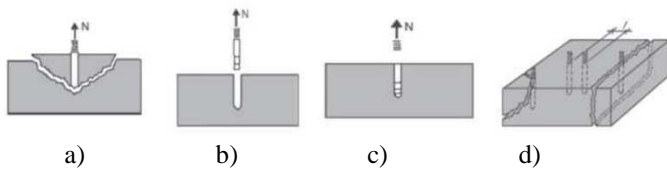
Failure methods: Cone (a), Pull-out (b), steel failure (c), splitting (d)
